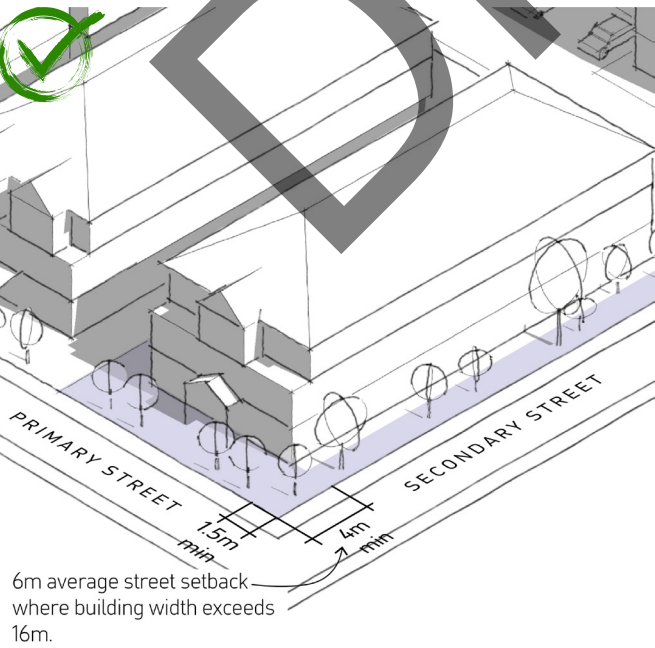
Multiple Dwellings - Street Setbacks Example Diagram
